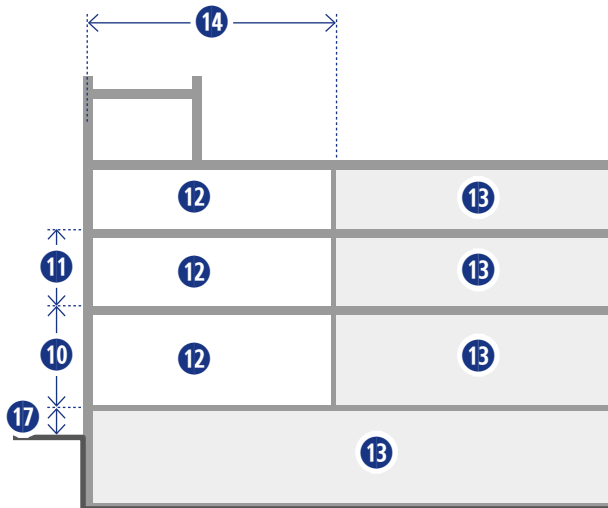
Civic Building; Floor-to-Floor Height & Use Requirements
